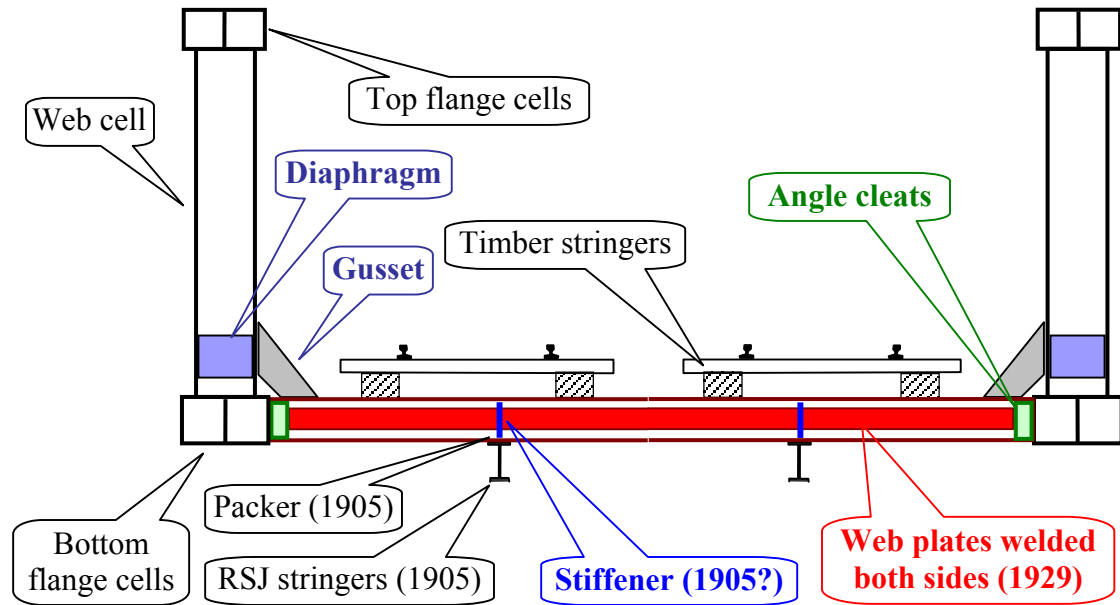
Cross-section showing original cross girder with added stringer support (1905)
